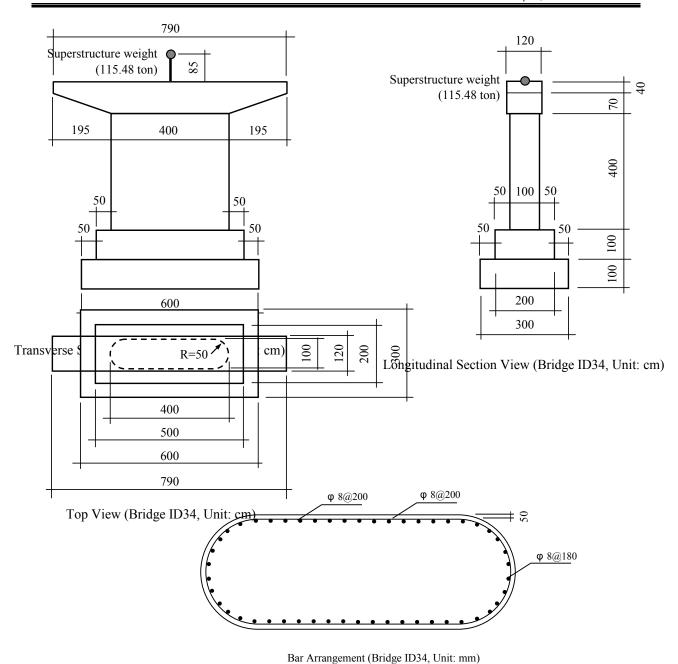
Dimension of bridge pier and bar arrangement (Bridge No.34)
